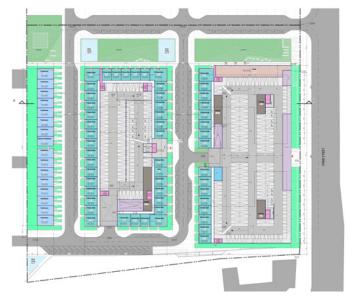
Floor Plan illustrating active frontages along Yonge Street
